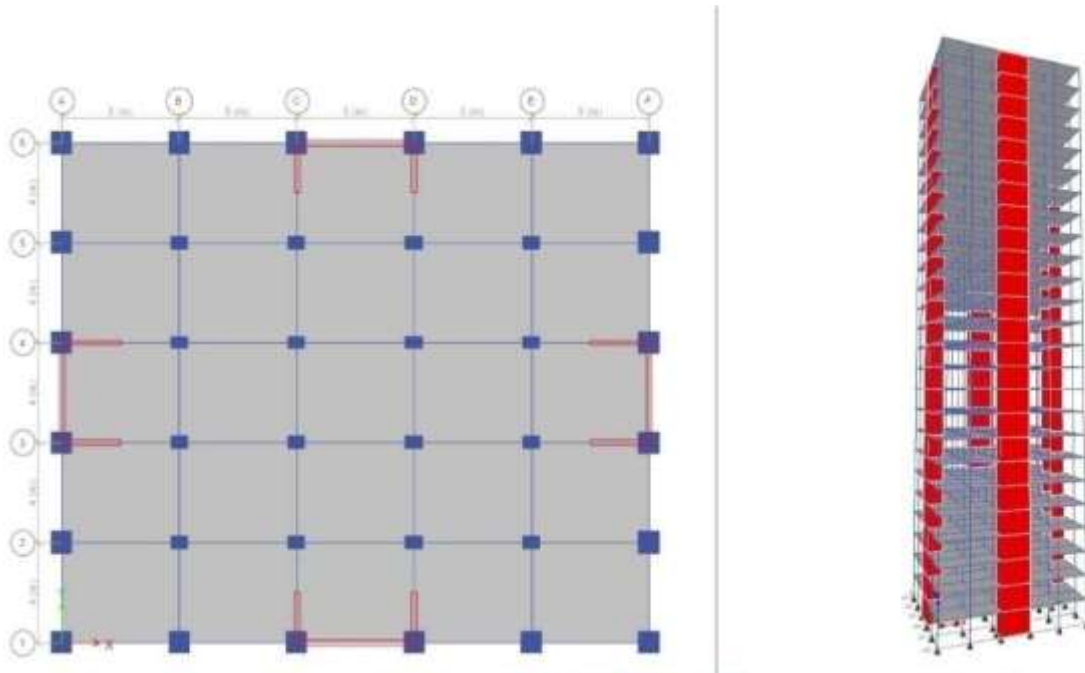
Plan and 3D View for model 3C-type shear wall
